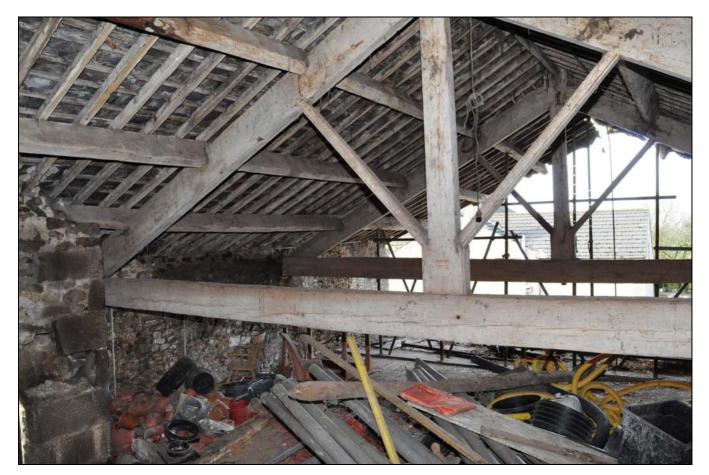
Barn 2: roof trusses and hayloft, looking south-west
